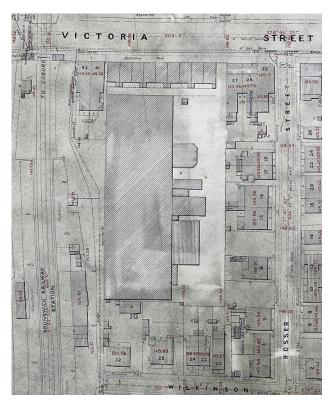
Plan from 1935 of the subject site showing more significant additions to the east of the factory
